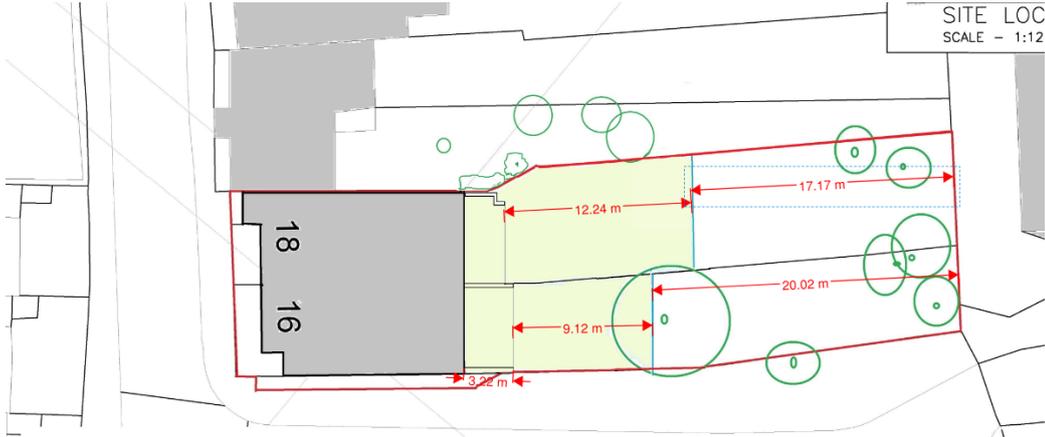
site plan showing the footprint of extension and area of garden that would remain undeveloped
